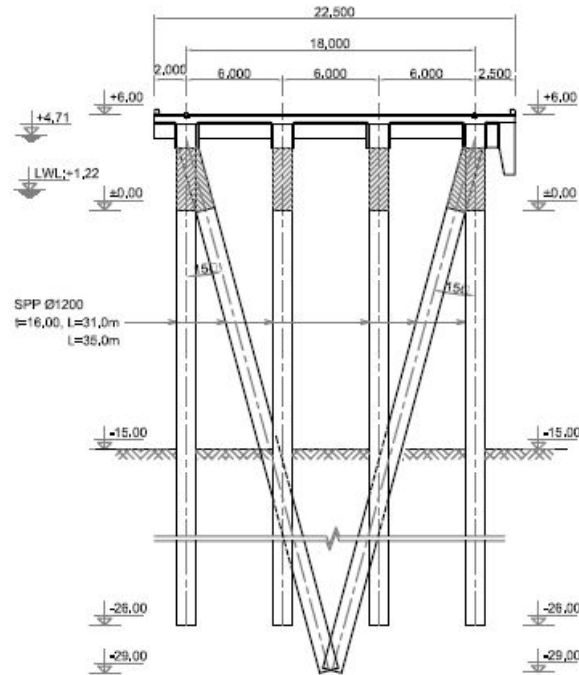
Typical Cross Section of the Unloading Berth
